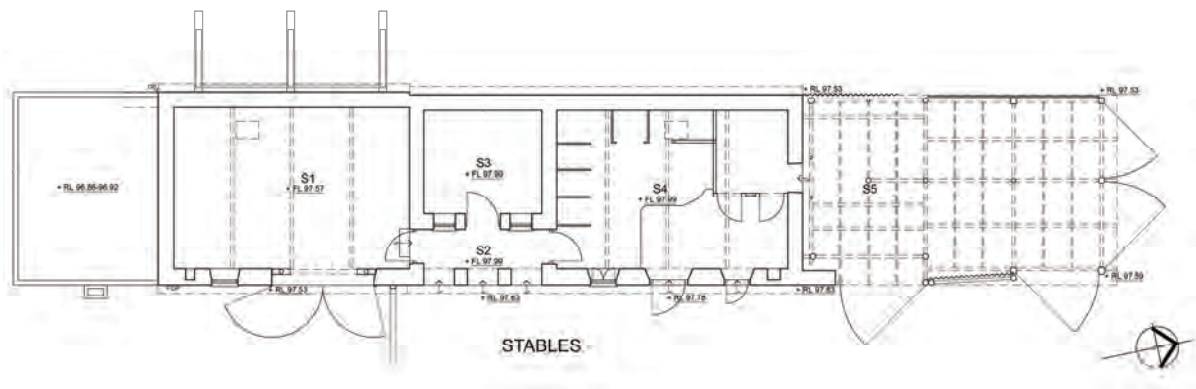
204: Measured floor plan of Stables. Source: LSJ Architects.
